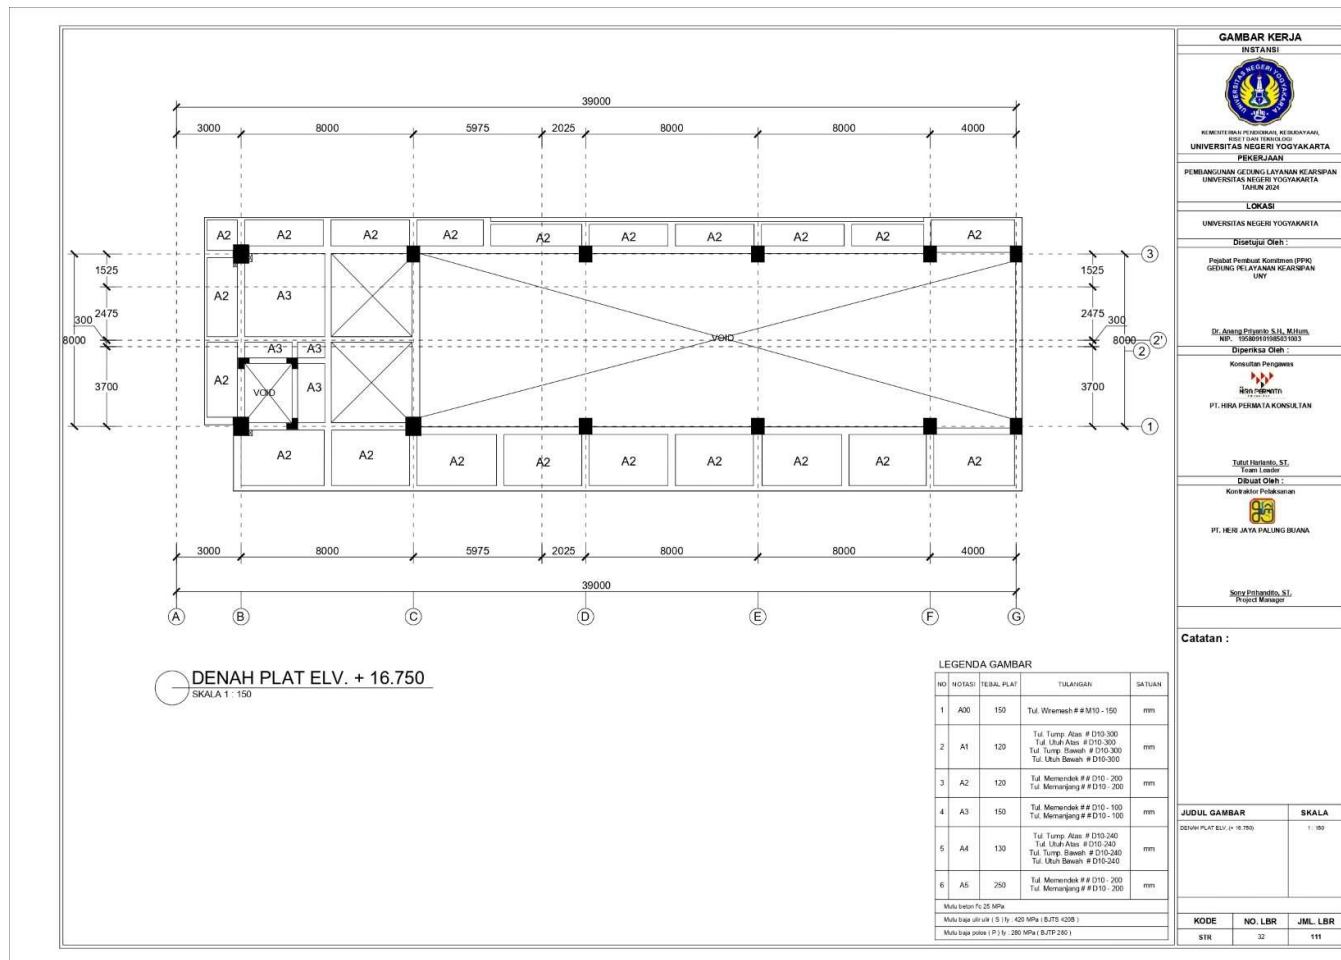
14 Slab Site Plan of Elv. +16.750
